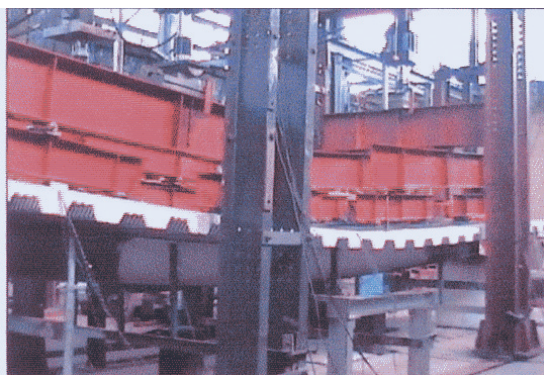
Full-scale composite beam test with deep trapezoidal steel deck
